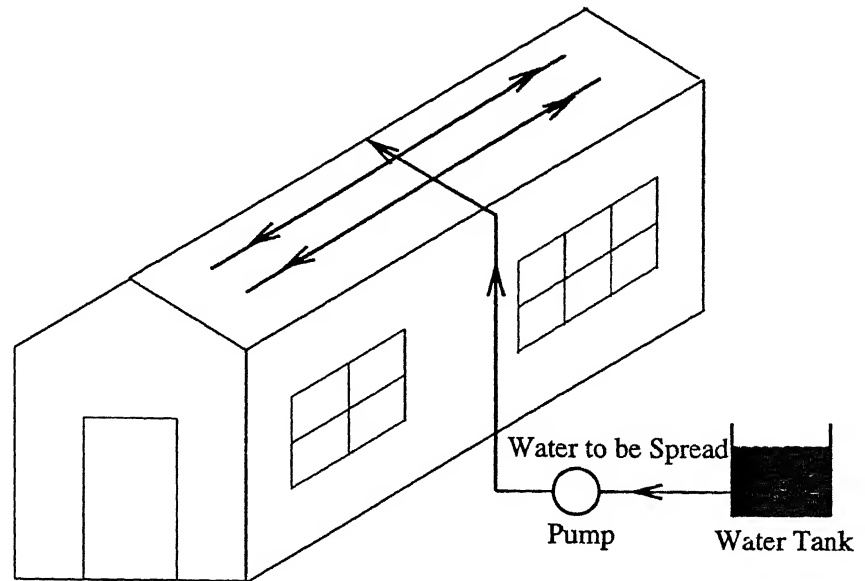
Schematic Arrangement for Roof Surface Evaporation.
